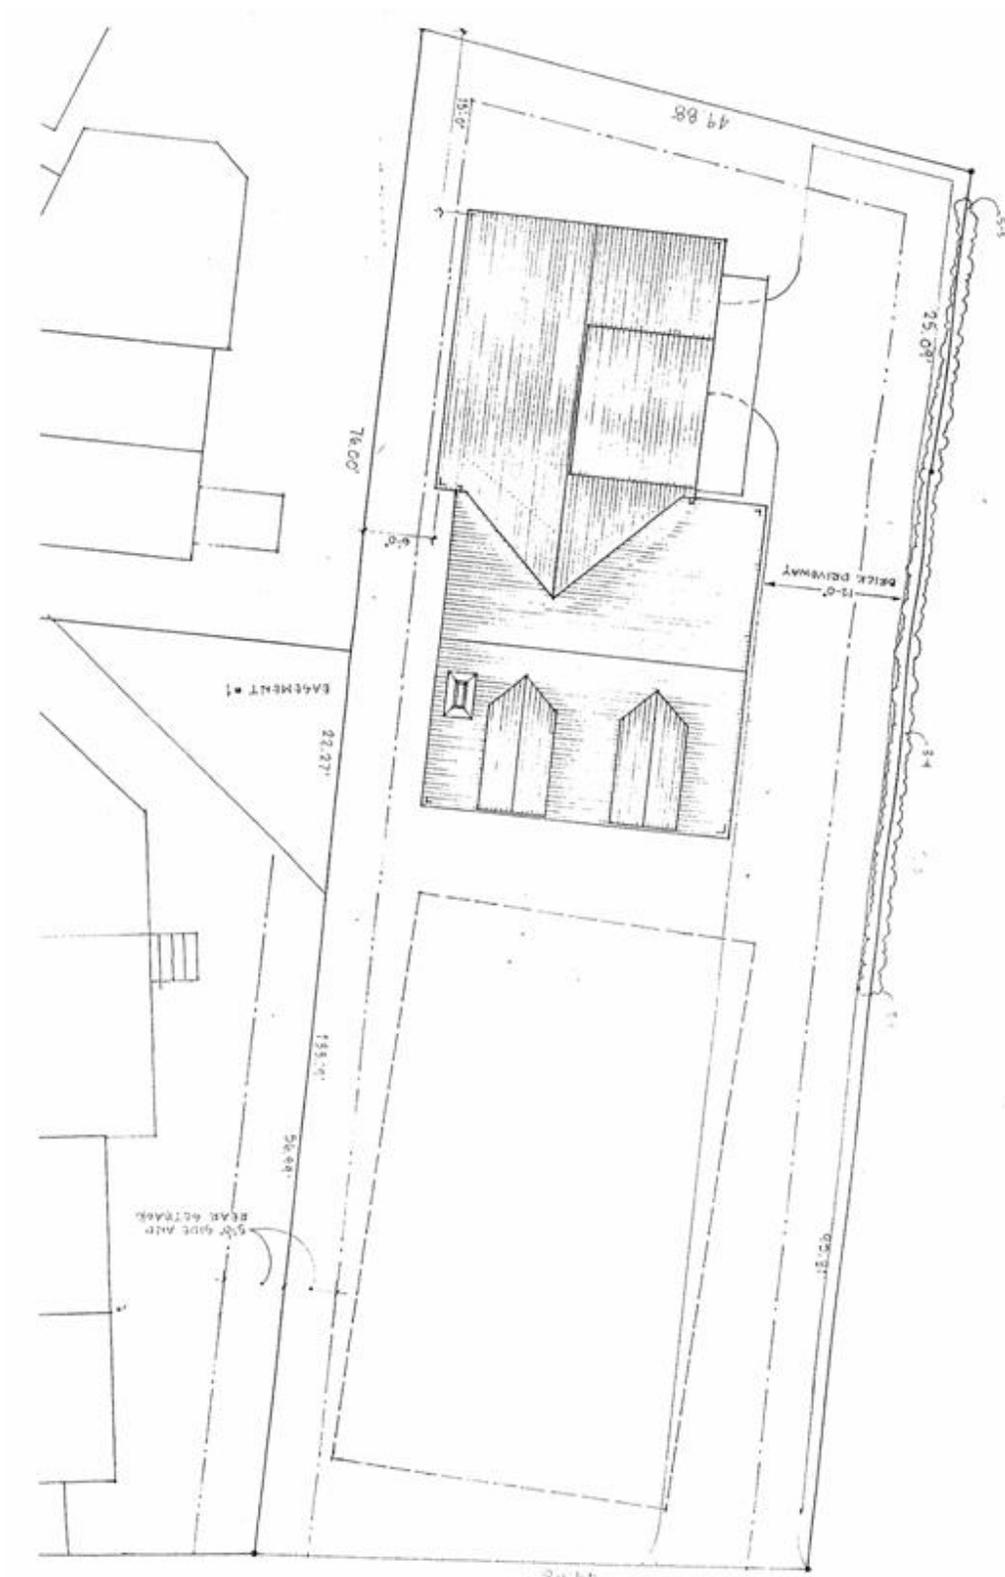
125 Main Street. Proposed site plan with a large front yard and rear garage apartment. Courtesy of Nantucket HDC.
